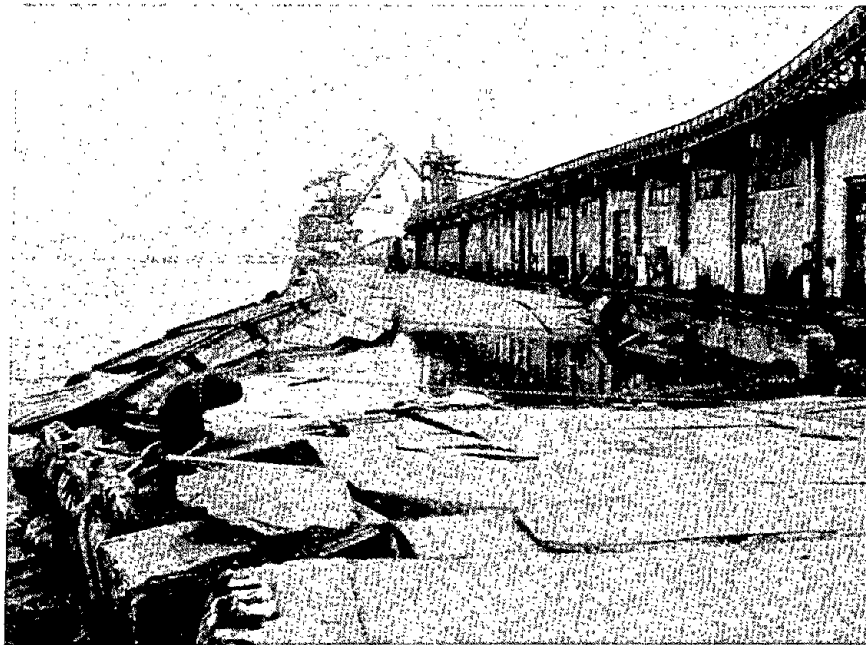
Damage to Sheet Pile Quay Wall (Nakajima Pier)
